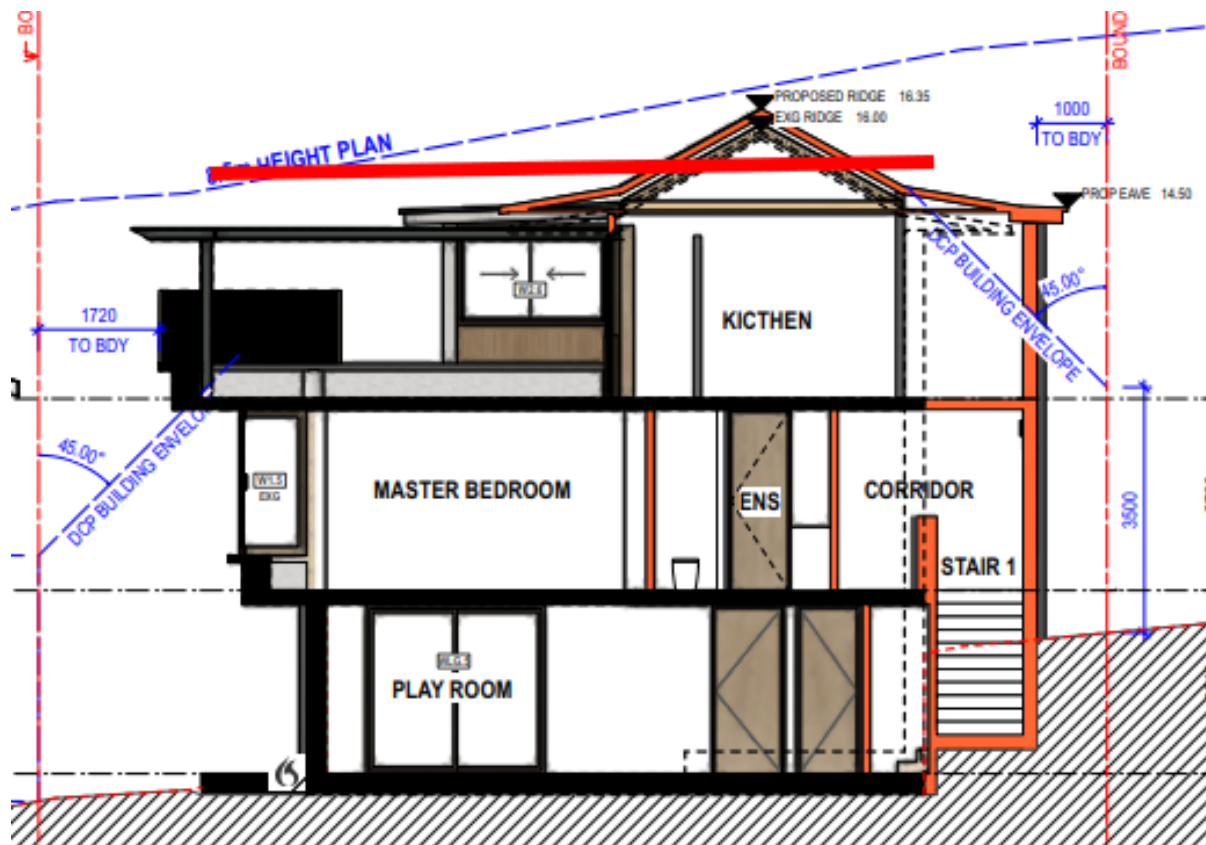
Section extract showing the 8.5m building height plane (in red) as measured above ground level existing as determined in accordance with *Merman Investments Pty Limited* and the non-compliant portion of the raised pitched roof form. This plan also shows the interpolated undisturbed natural ground level 8.5m building height plane (in blue) demonstrating compliance with the 8.5m building height standard.
